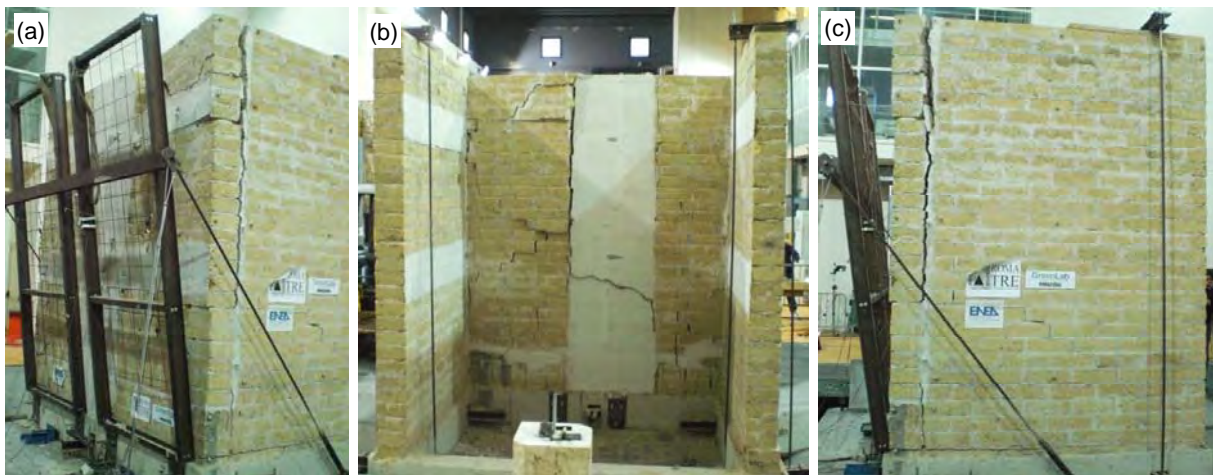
Specimen after collapse: front wall from outside (a) and inside (b), and right side wall (c).
